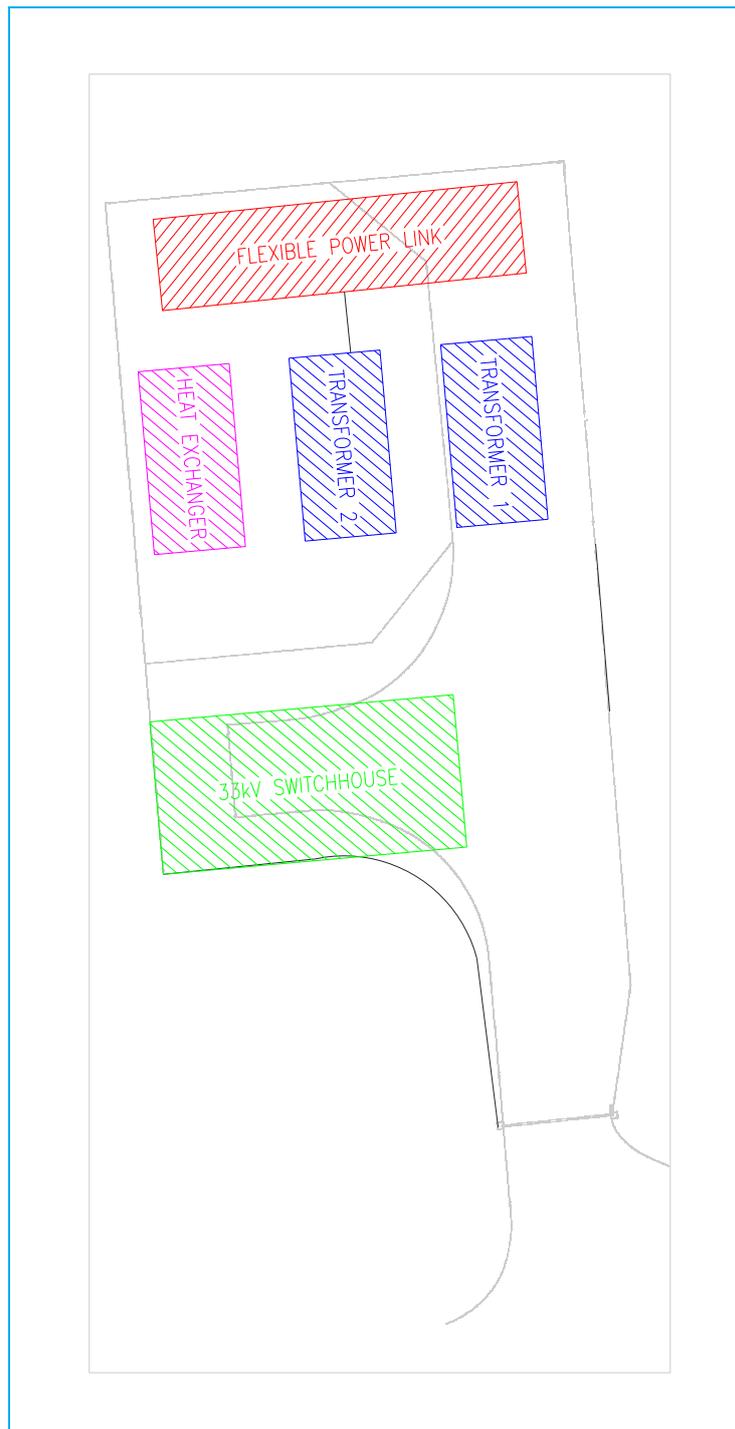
Proposed FPL and 33kV Switchhouse Layout at Winslakefoot
